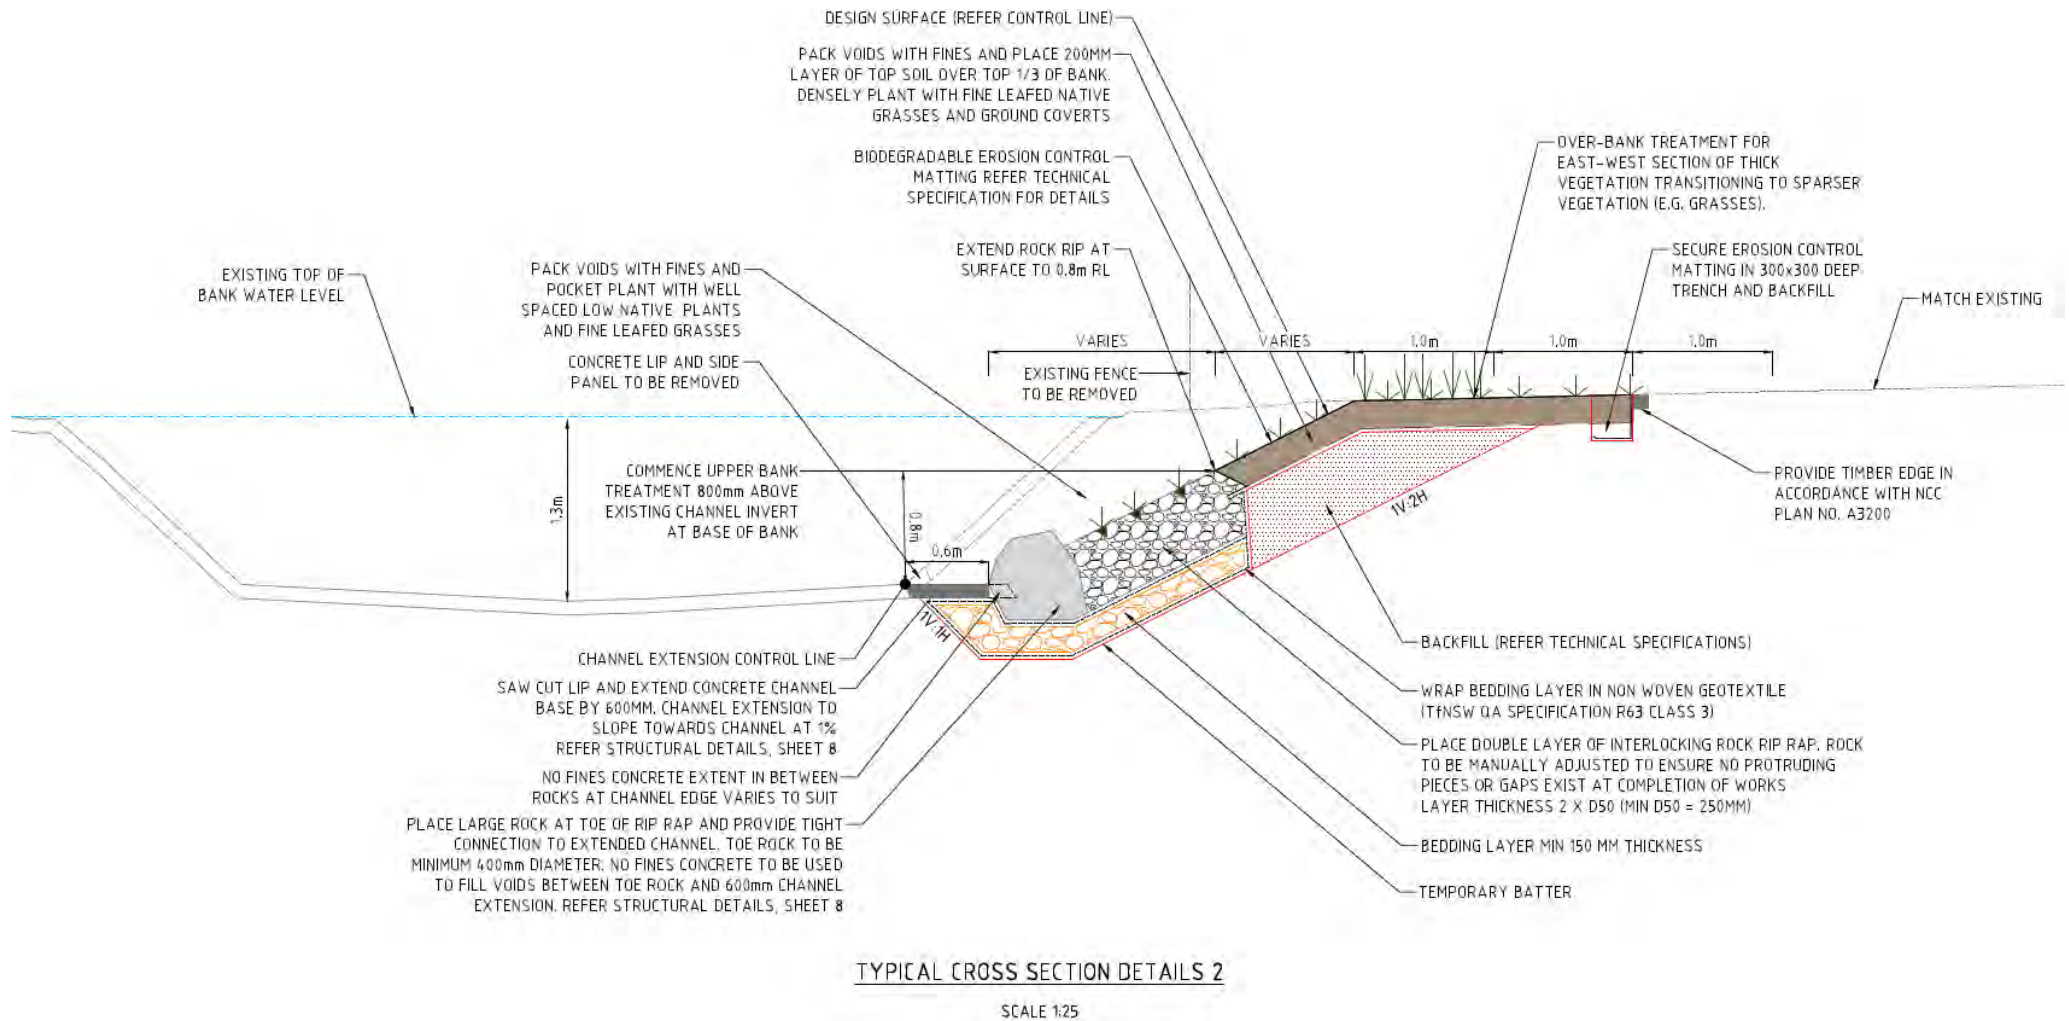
Dark Creek Heaton Park, Jesmond (Upstream) – Typical Cross-Section
